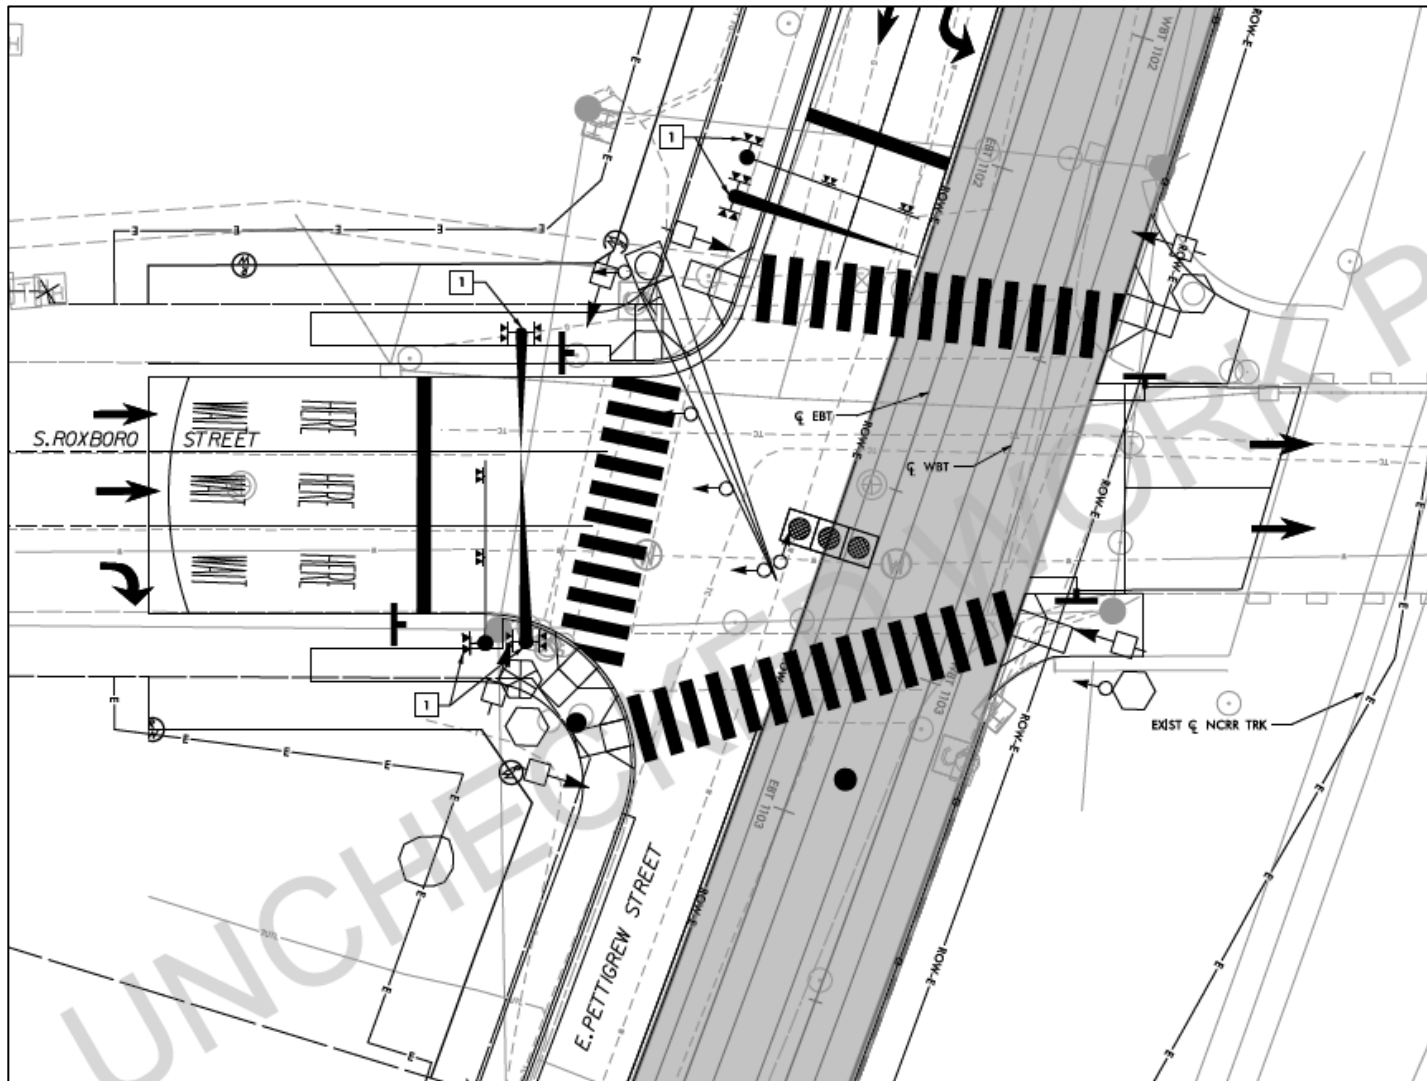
Proposed project plans in area of Southern Railway Bridge (Seaboard Coastline Railroad Overpass) (DH 2504 and DH1067)
